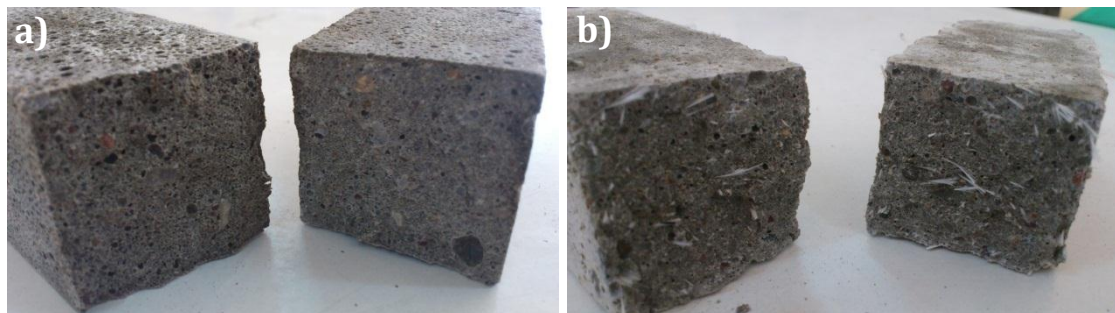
a) The structural lightweight foamed concrete for prism specimen after flexural strength testing (mix N0). b) The structural lightweight foamed concrete addition glass fibers for prism specimen after flexural strength testing (mix N3).
